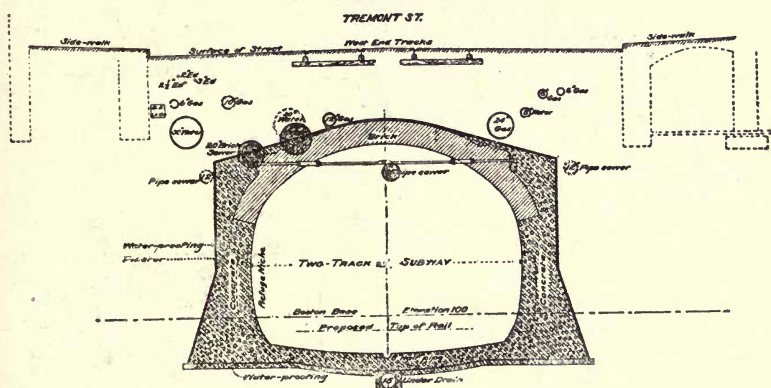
Typical Section of the Boston Subway, in Concrete and Brick Work; Double-track.
